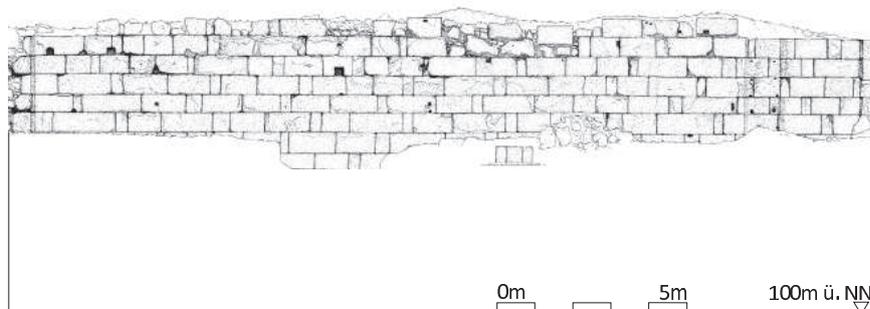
Pergamon, Masonry A. South Gate, north-west wall of the courtyard
